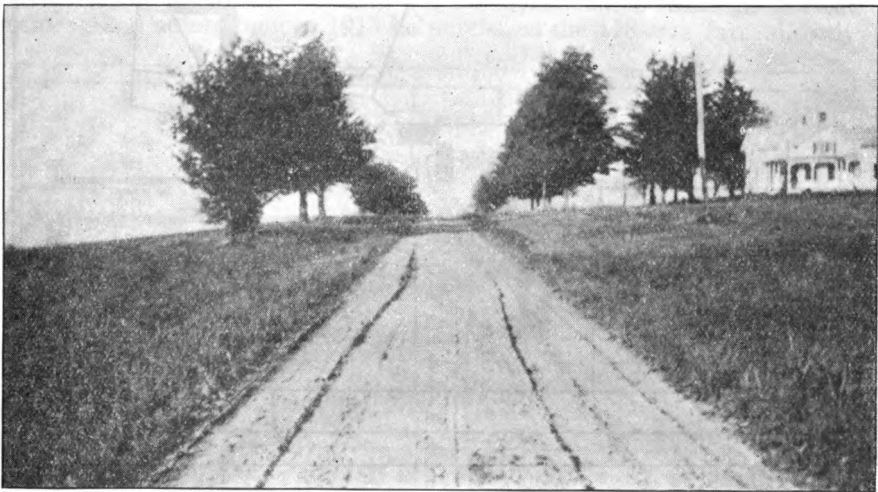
WHERE ROAD FENCES ARE UNNECESSARY, THEIR REMOVAL PERMITS FARMING TO THE ROAD DITCH
